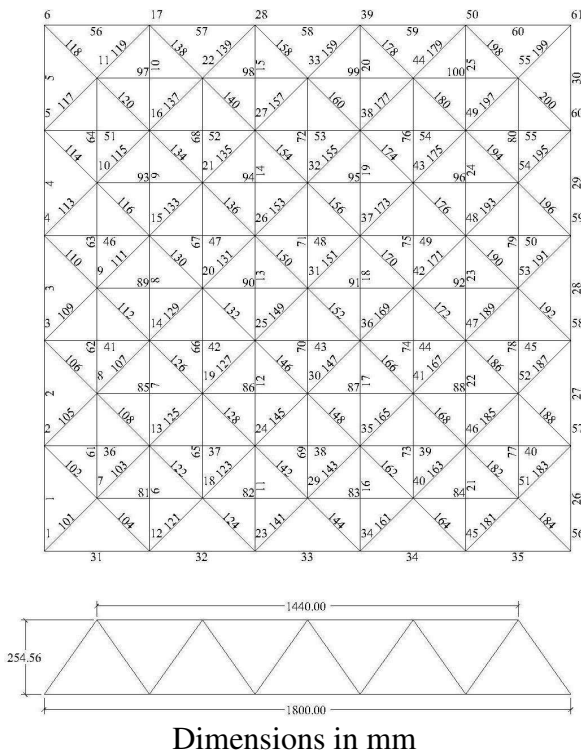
Plan and elevation of Model 1 and Model 2 [8].
